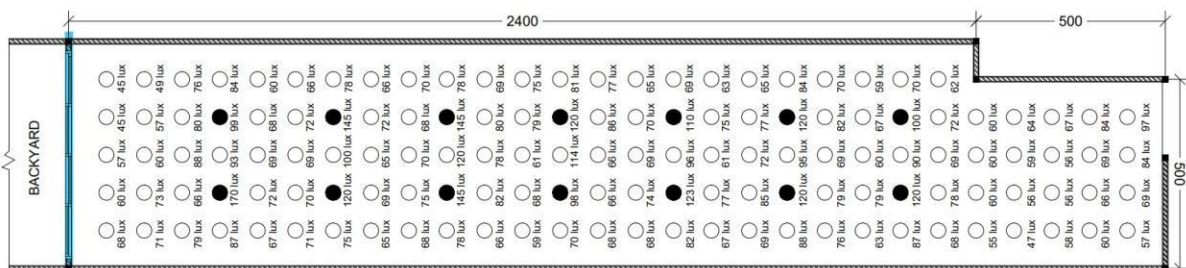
Layout plan, embedding large glass sliding door (blue highlighted) in the rear side of the building
